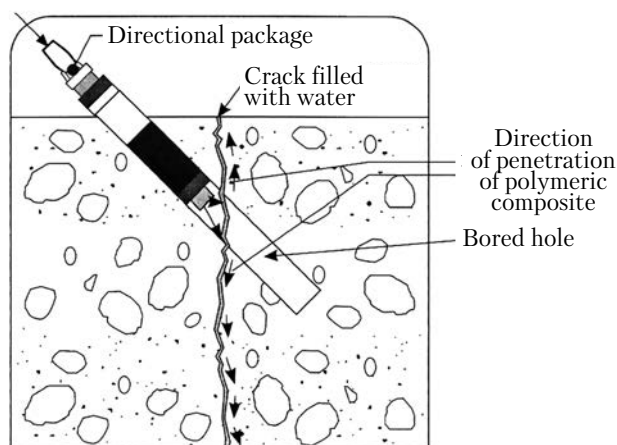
Injection of polyurethane composition into a through crack filled with water, in concrete structure [11]
